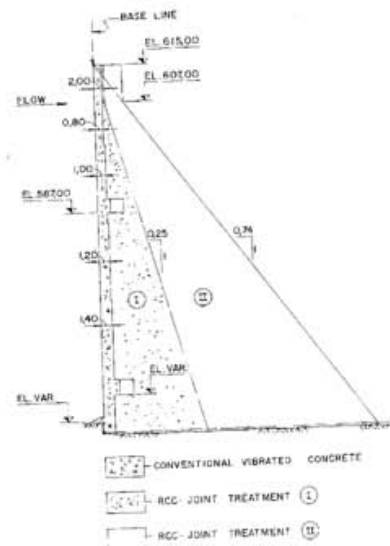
Transversal section from Jordão Dam, showing the “Concrete Face”
